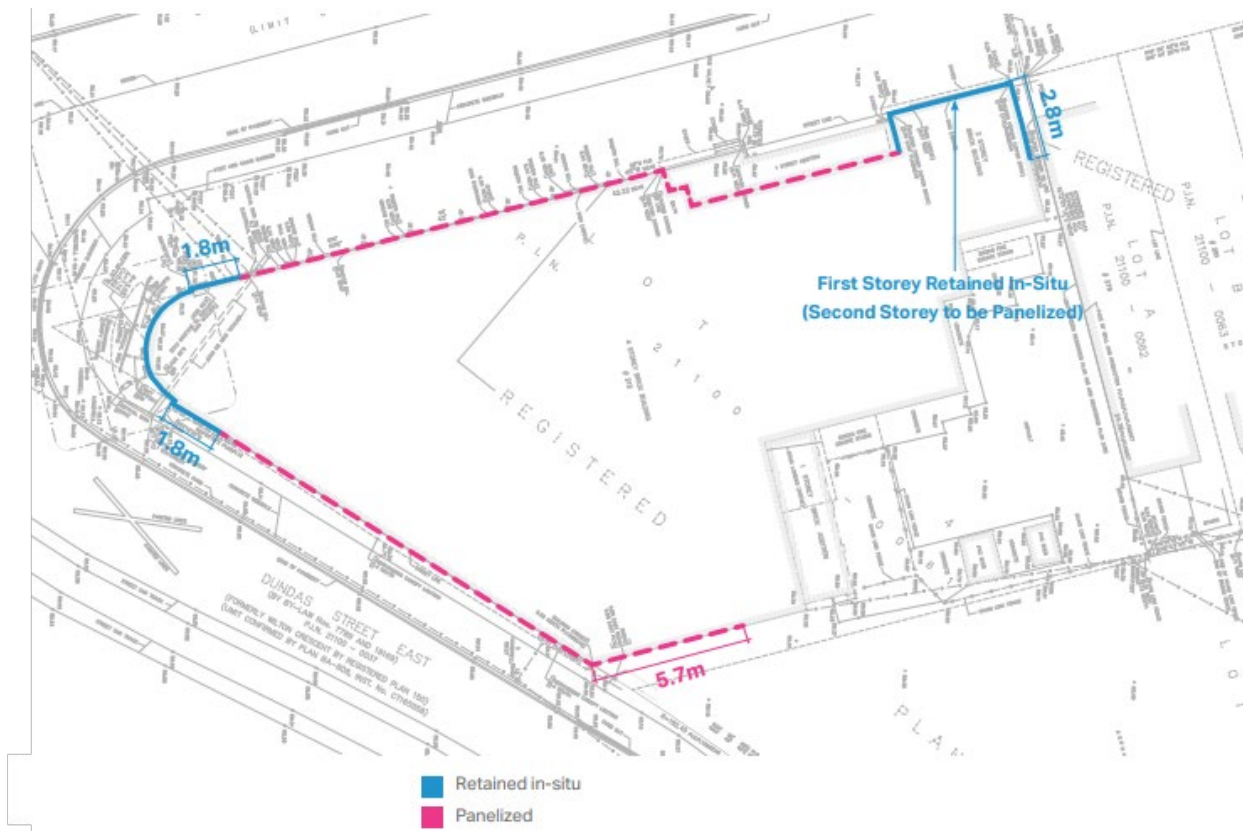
Diagram showing retained and panelized elevations, included for illustration purposes (Giaino + Associates Architects Inc., April 16, 2026).
